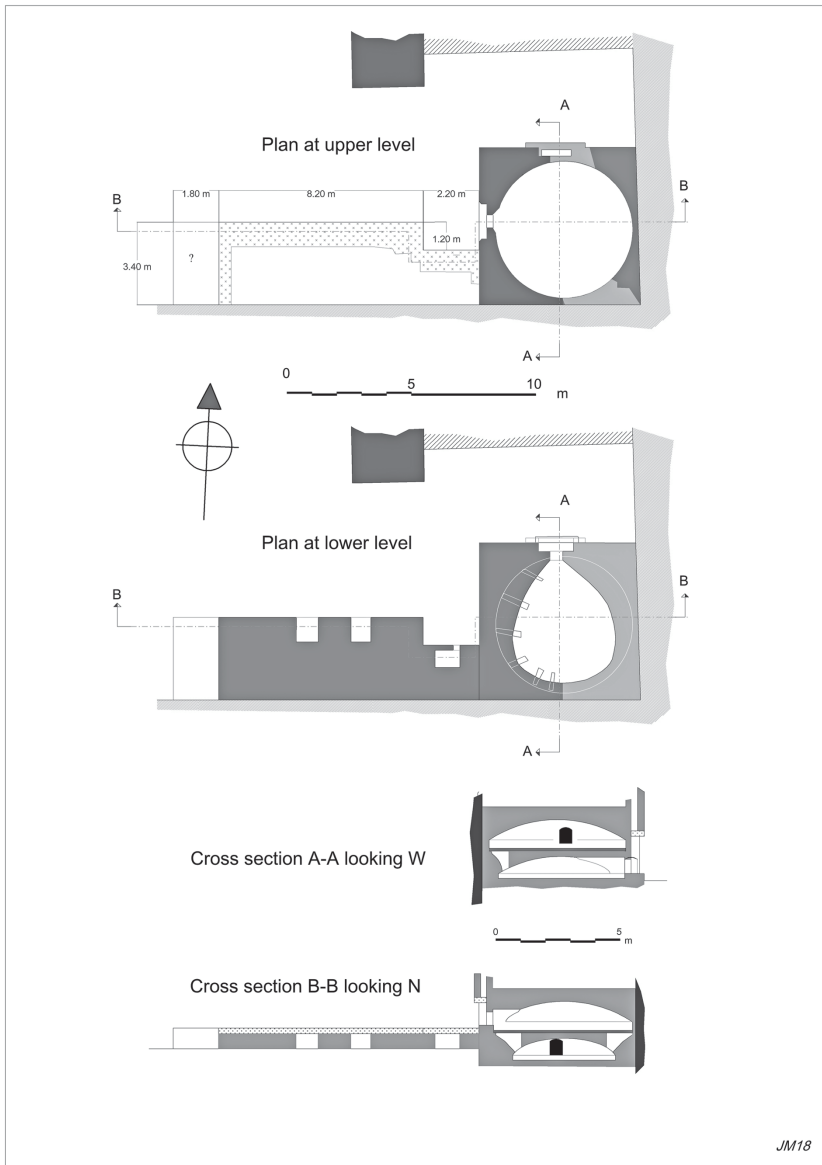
Le Chastellet du Gué-de-Jacob (*Vadum Jacob*/Ateret, Israel). Reconstructed plan and sections (Jean Mesqui 2018)
